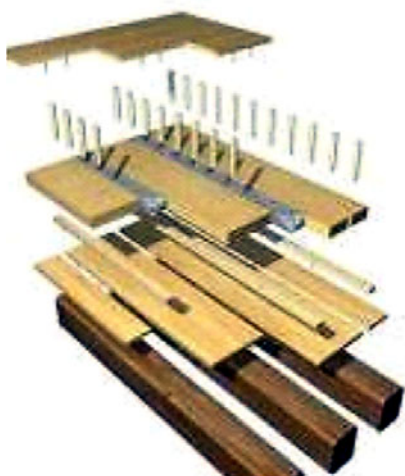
Strengthening interventions, in and out of plane stiffening of an existing wooden floor: wooden planks at the extrados connected by wooden dowels
